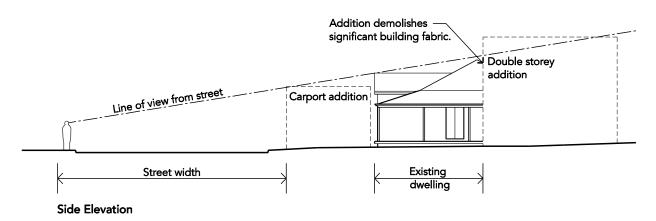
Elevations illustrating incompatible alterations and additions – Griffiths Architects 2012.
